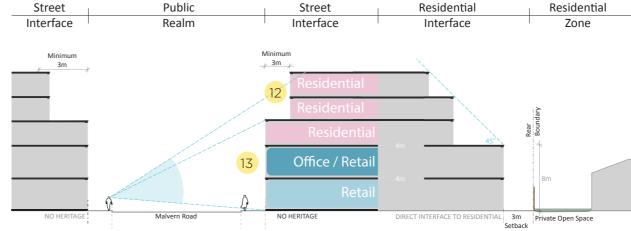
Street Section and Direct Residential Interface - Non Heritage
